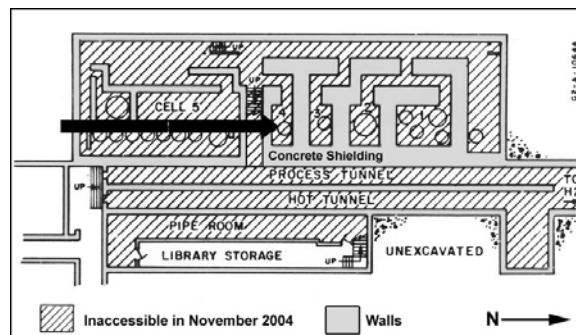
Building G2, 325-Foot Level, Cell No. 4
